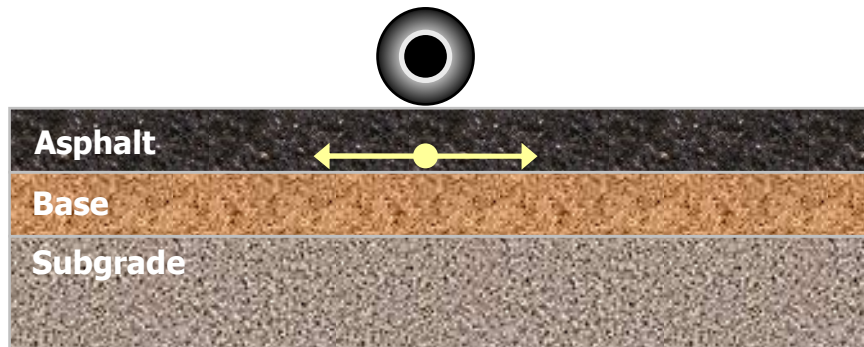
Pavement cross section depicting maximum tensile strains occurring on the bottom of the asphalt pavement due to loading that cause fatigue cracking process.
